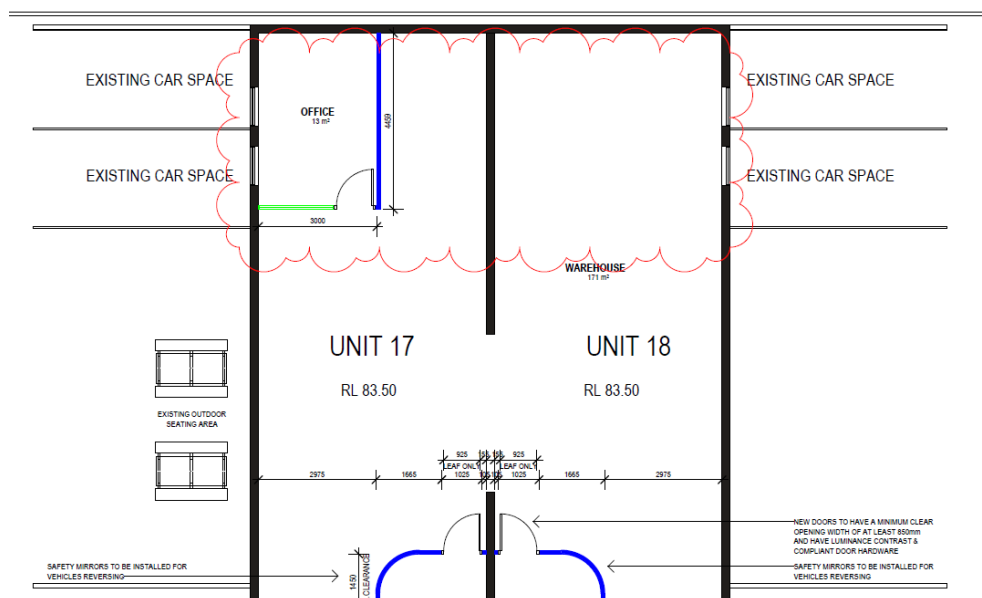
Proposed Ground Floor Plan, Drawing No. A090, Issue G, dated 29 June 2021
